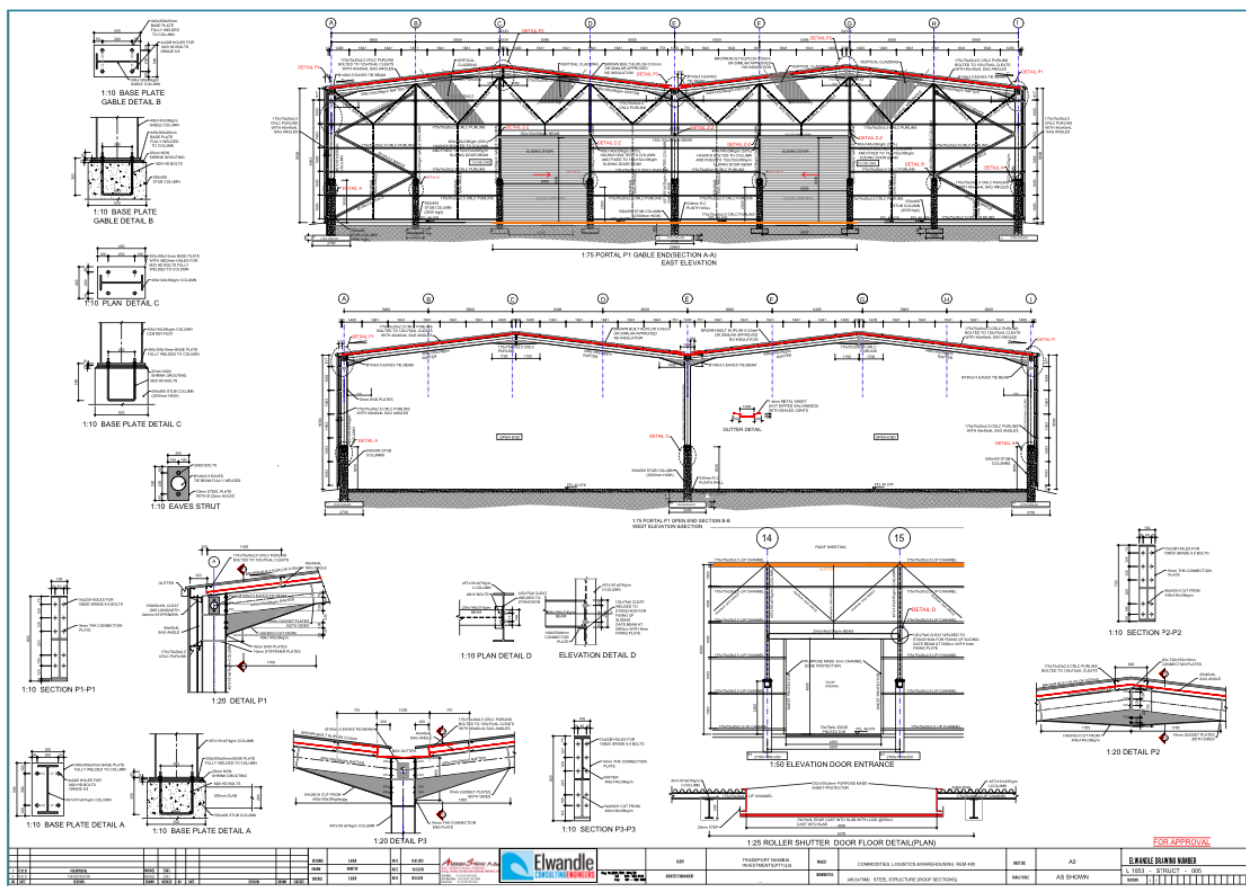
The technical specification and layout of the proposed warehouse facilities to be constructed
